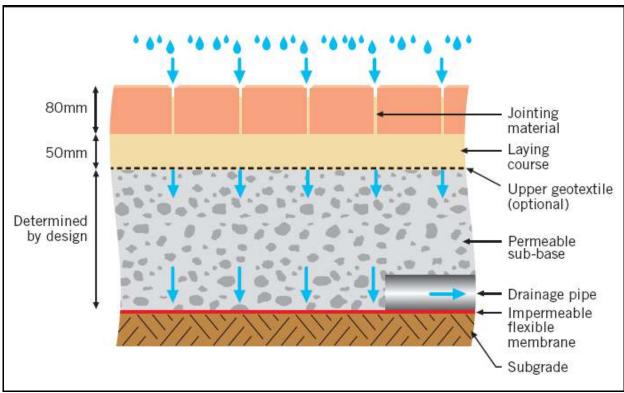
Section through a permeable surface (Source: Interpave Permeable pavements – guide to the design construction and maintenance of concrete block permeable pavements dated 2010)
